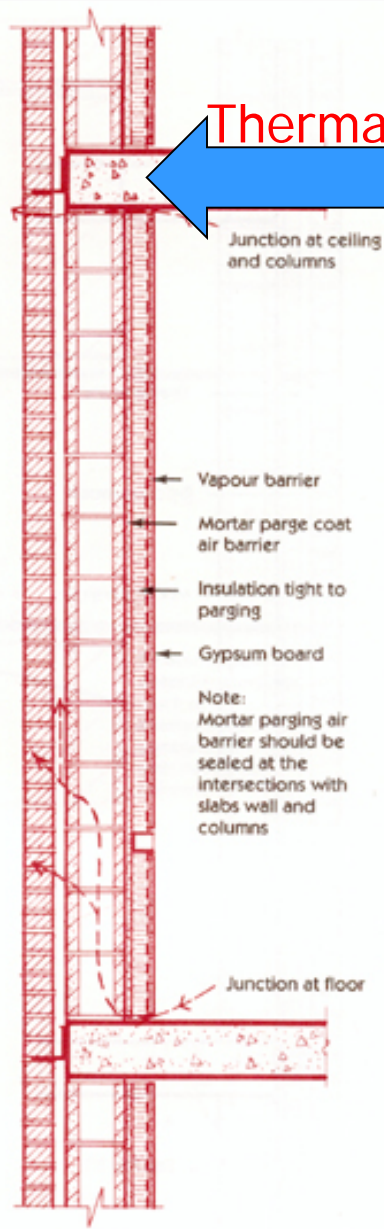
Parge coat air barrier requires sealing at junctions with ceiling floor slabs and columns (ties, flashings and weepholes not shown)
